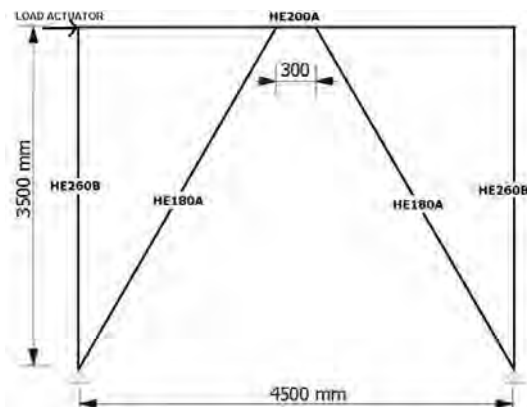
EBF specimens: static scheme, loading conditions and cross-sections.
